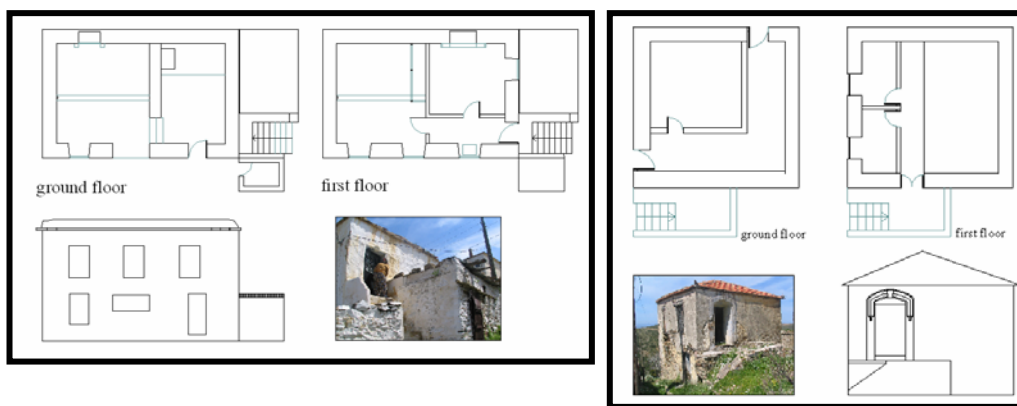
no: 42 and no: 56 are both houses with outdoor stairs but they have different plan schemes
